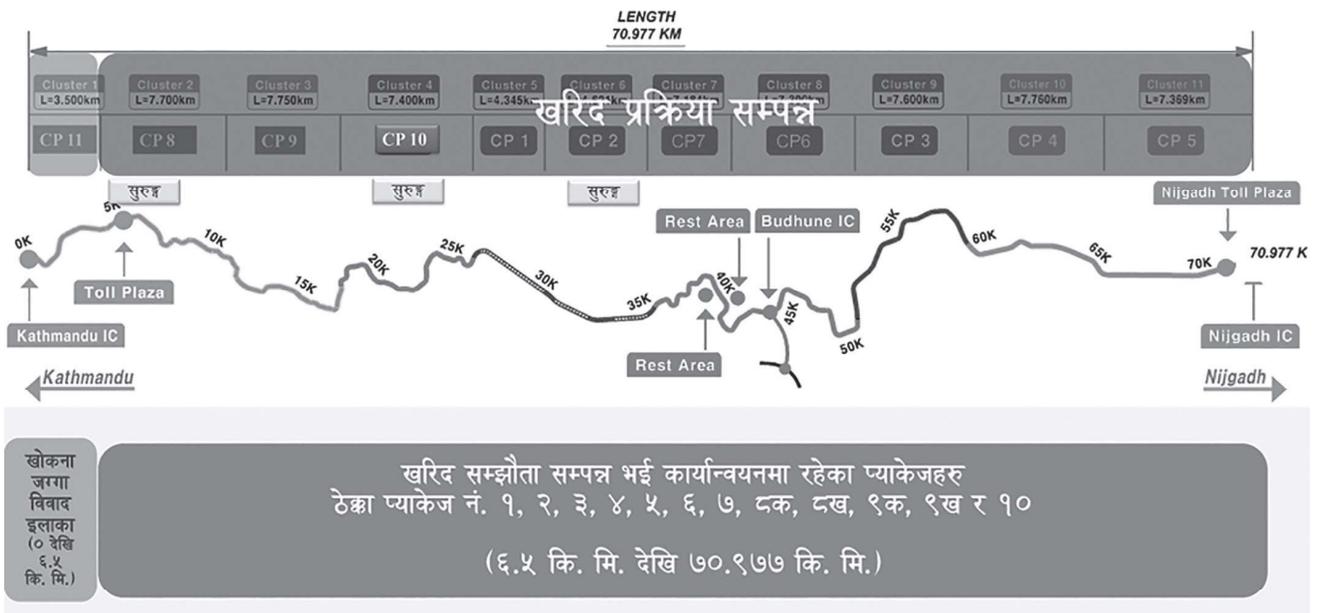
KTFT Road Project alignment showing different packages undergone for construction
